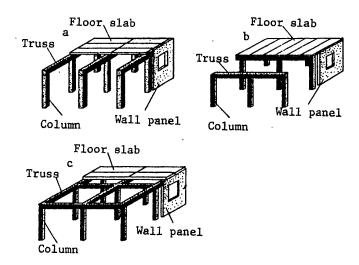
Frame system of low-rise residential houses. a--Layout with longitudinal frame; b--layout with transverse frame; c--layout with mixed frame.
